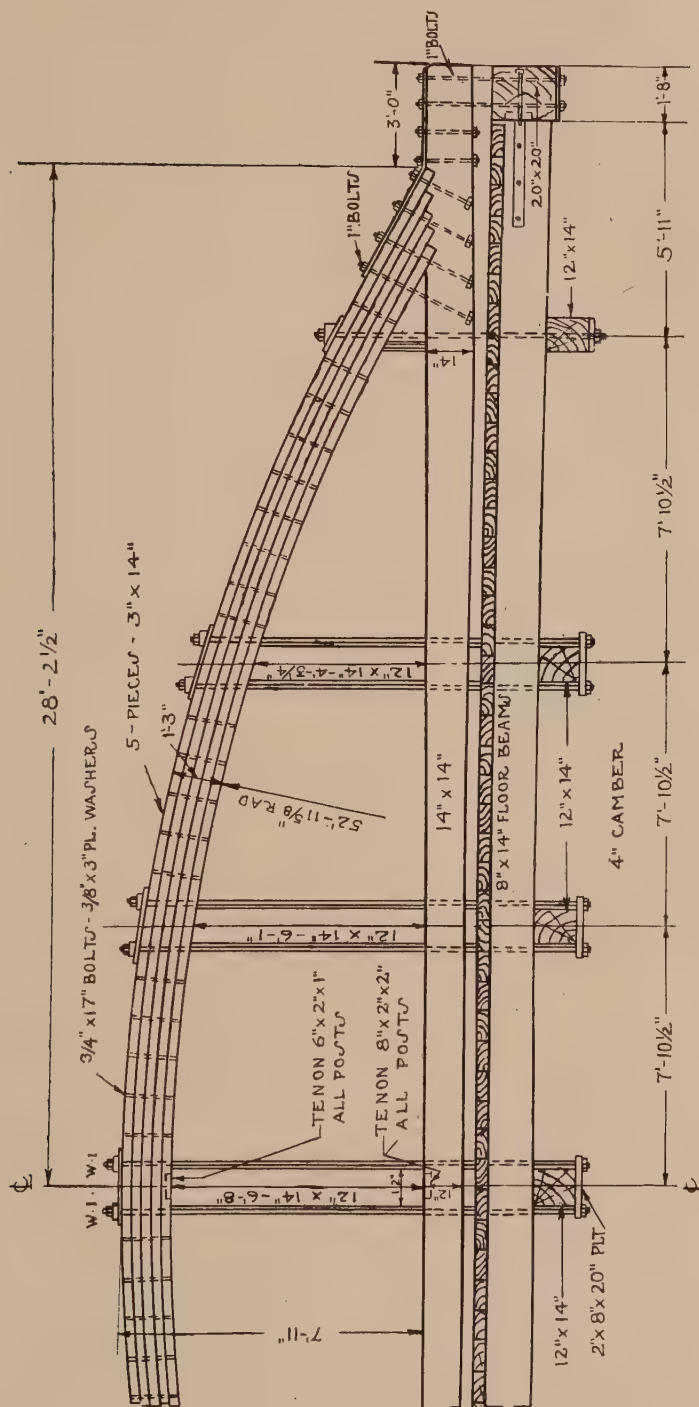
Bow-string truss, D. L. and W. Railroad.
